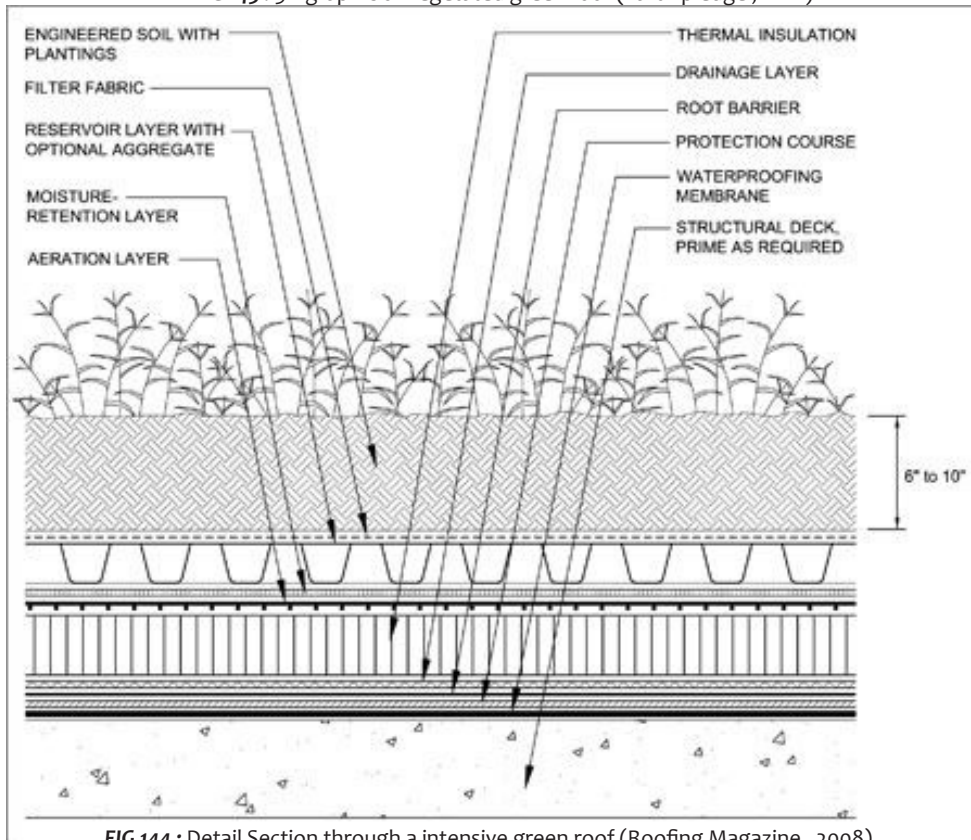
Detail Section through a intensive green roof (Roofing Magazine , 2008)
